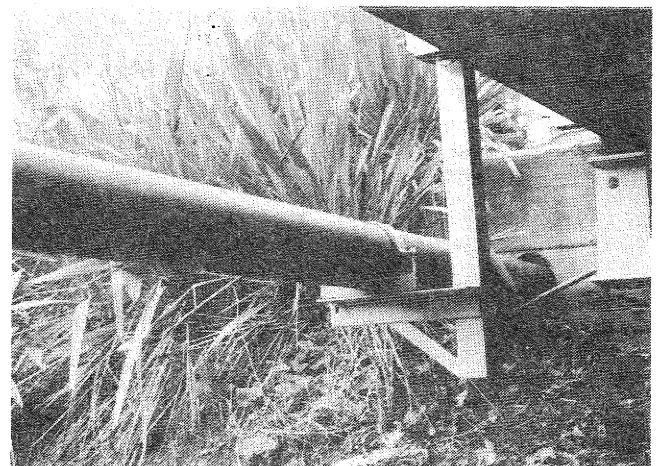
Sewer pipe on Kawerau Bridge
